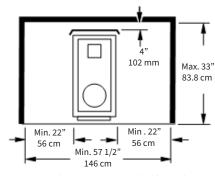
Alcove; Rear Heat Shield, Singlewall pipe and no wall protection.
